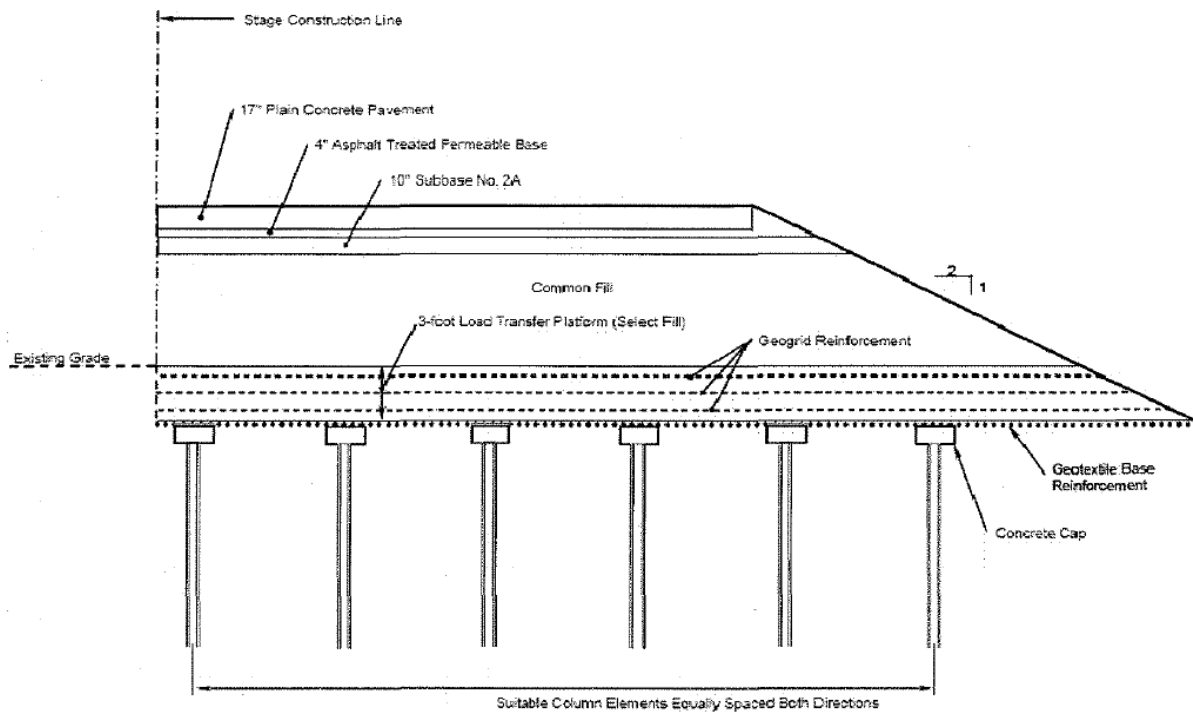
Example of a typical column supported roadway section as proposed for 0095, Section BRI.
